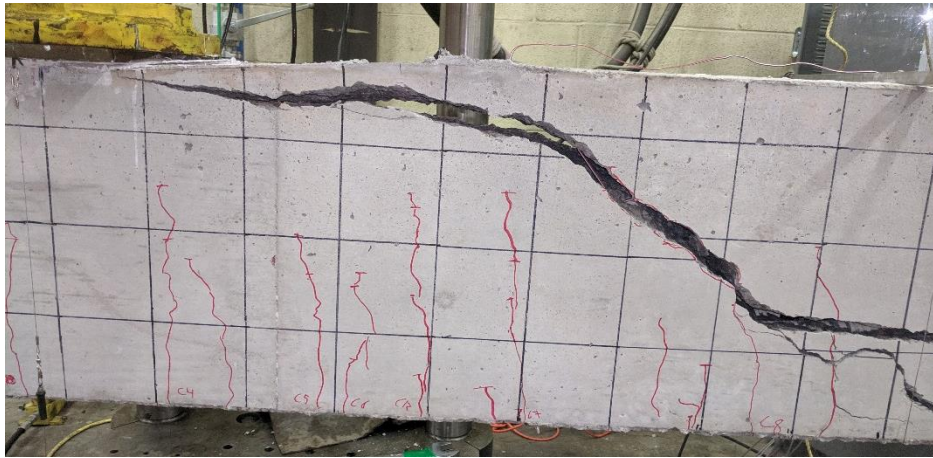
BM 6.5-N: Crack patterns at failure
